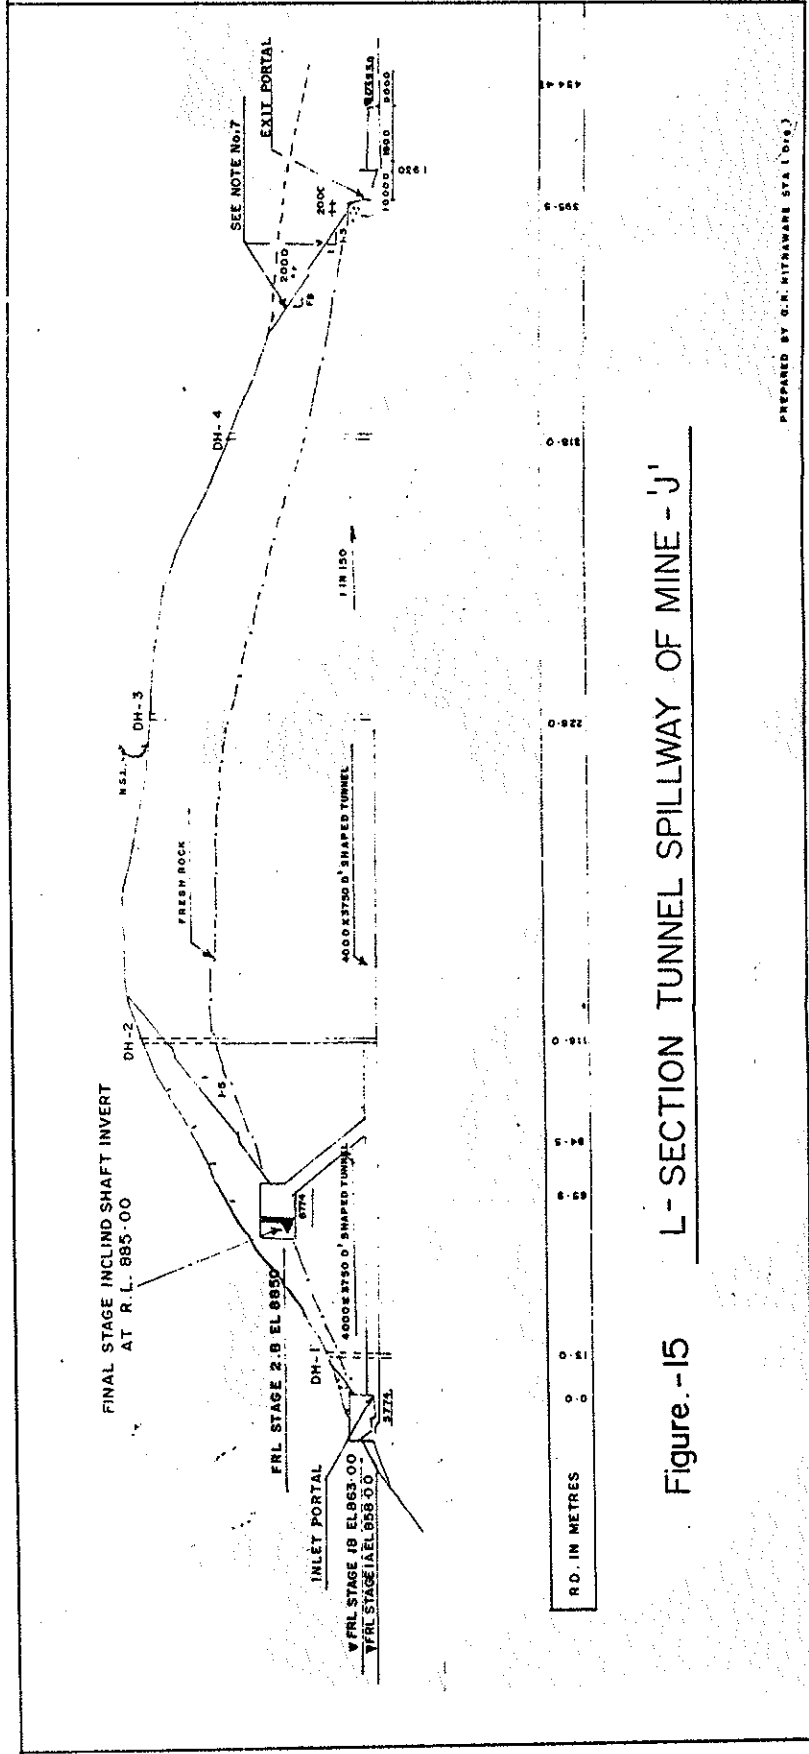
L-SECTION TUNNEL SPILLWAY OF MINE - 'J'
